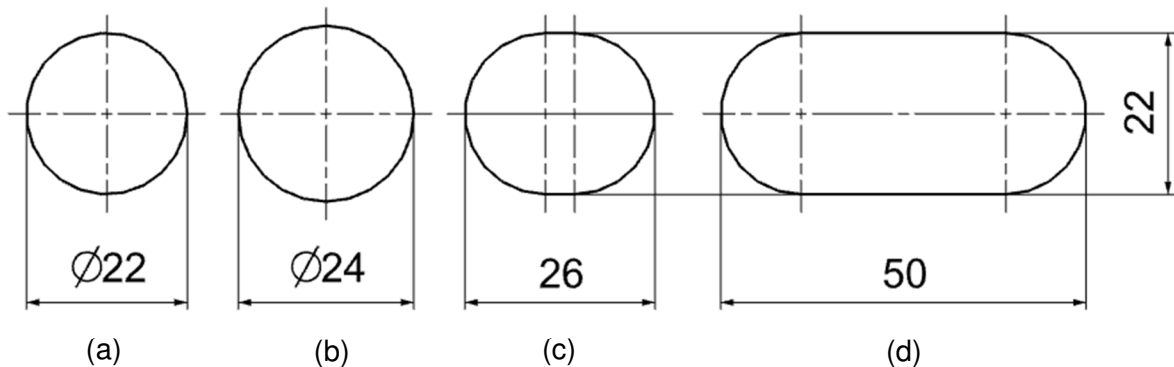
Bolt hole dimensions for a (a) normal round, (b) oversized, (c) short slotted and (d) long slotted hole. Dimensions according to EN 1090-2 [4] and given in millimetres.
